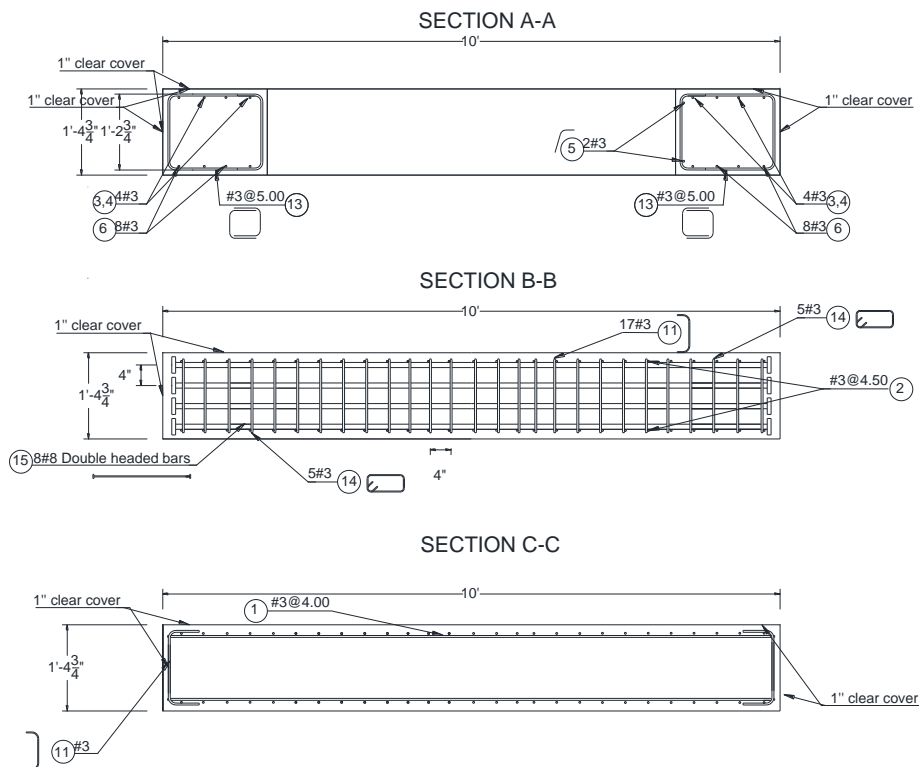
Section A-A, B-B and C-C in design drawings for Specimens 8 and 10 (see Figure 6.1 for the location of the sections)
